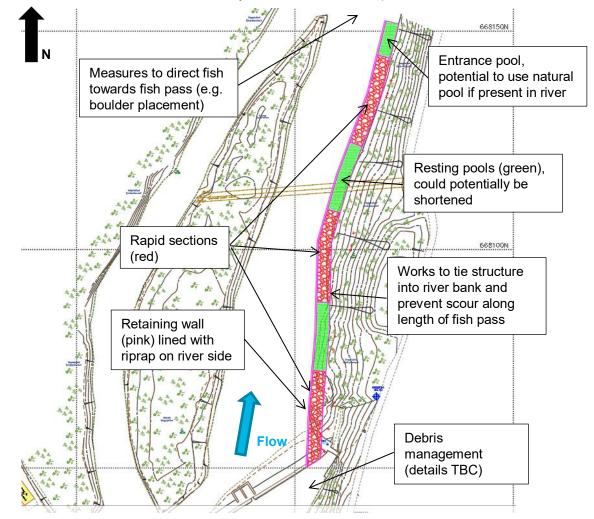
Plan of the Canalised Fish Pass initial design option
